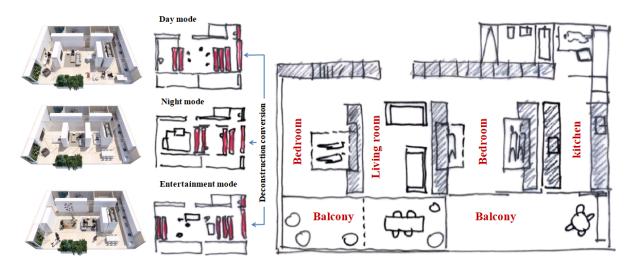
Split Shift Home proposed by Bagot to accommodate all daily lifestyles (© Woods Bagot). Arrows refer to that the proposed floor plan could be split into three modes.
